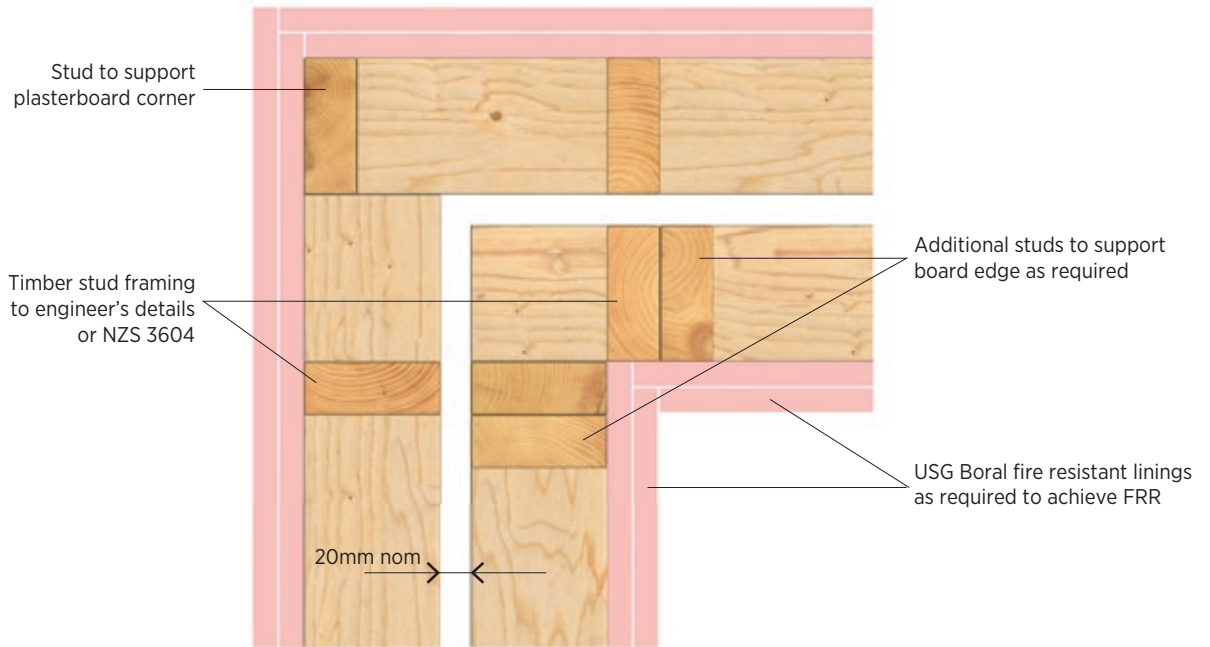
Twin Timber Stud Wall - Corner Junction Detail
